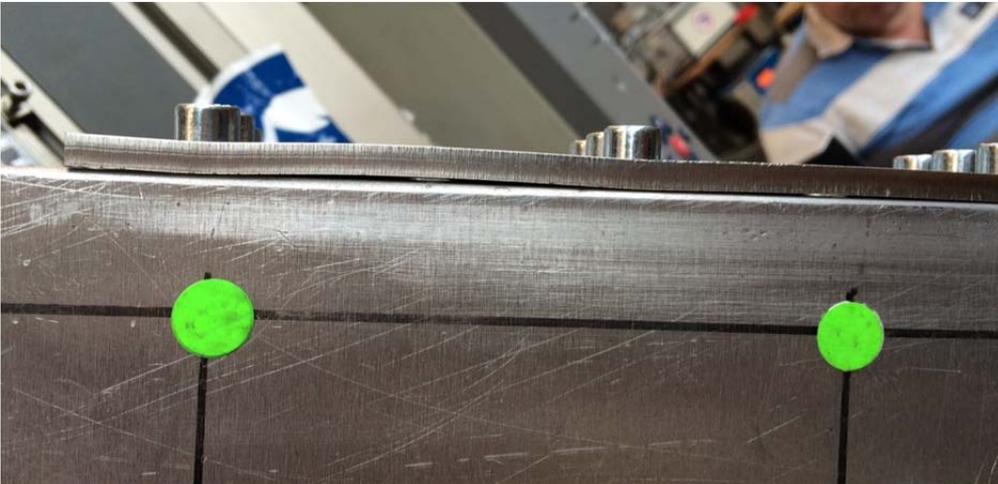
Deformation of the 5mm L-shaped connection pattern 1, side view
